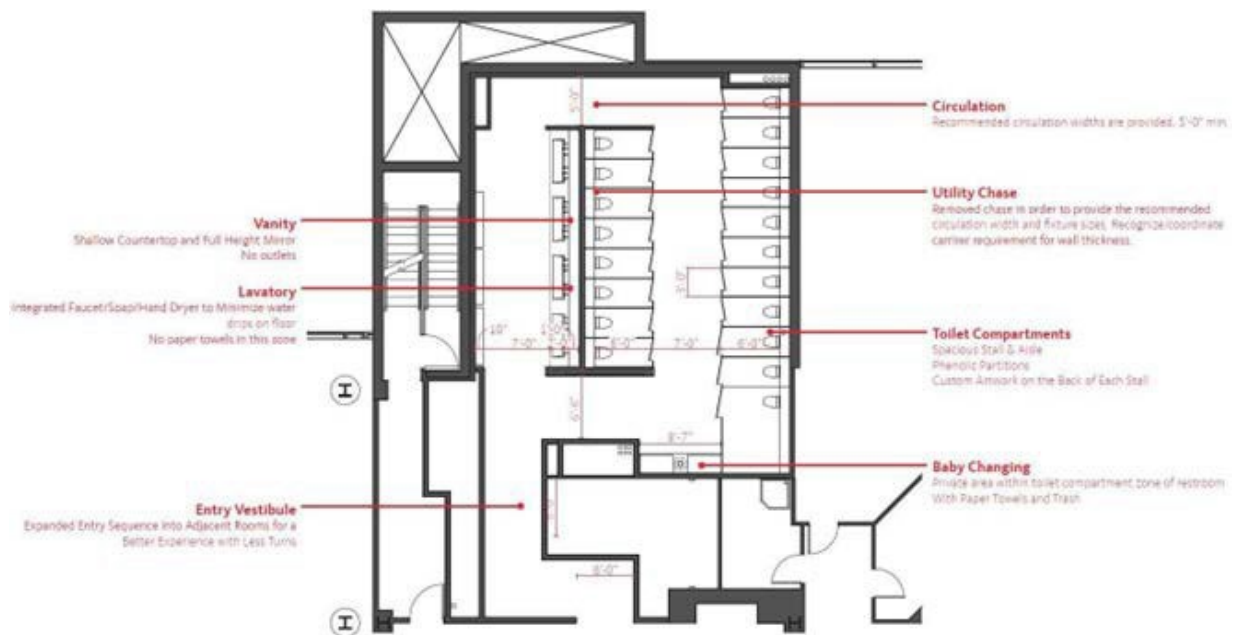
Example Proposed Restroom Remodel Plan - Concourse B, Center Core
